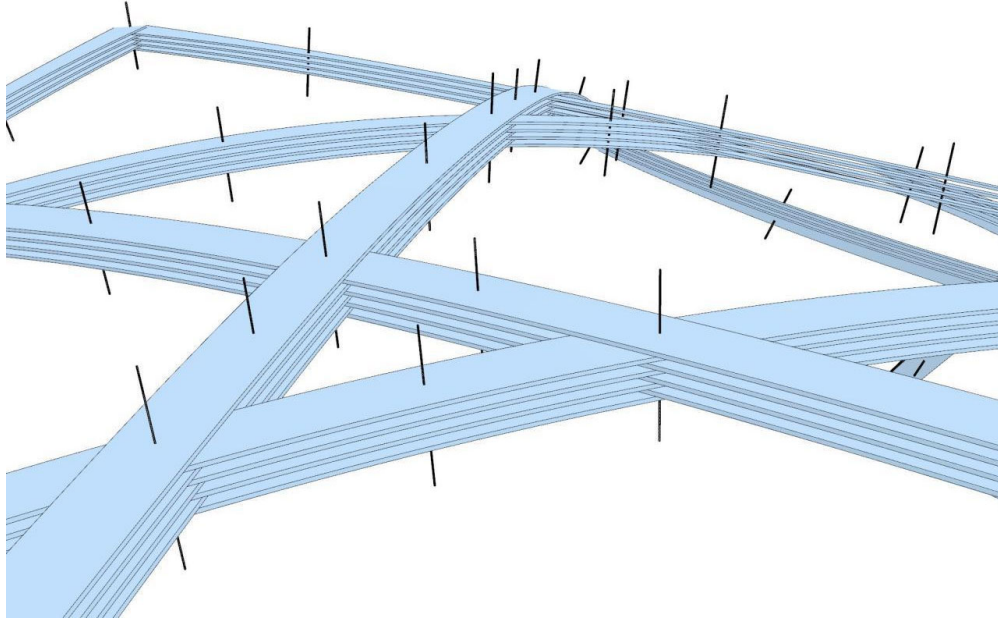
Stacking and weaving of 5mm planks for layered beam models. Black lines notify locations of modeled spacers at each grid intersection and segments between.
